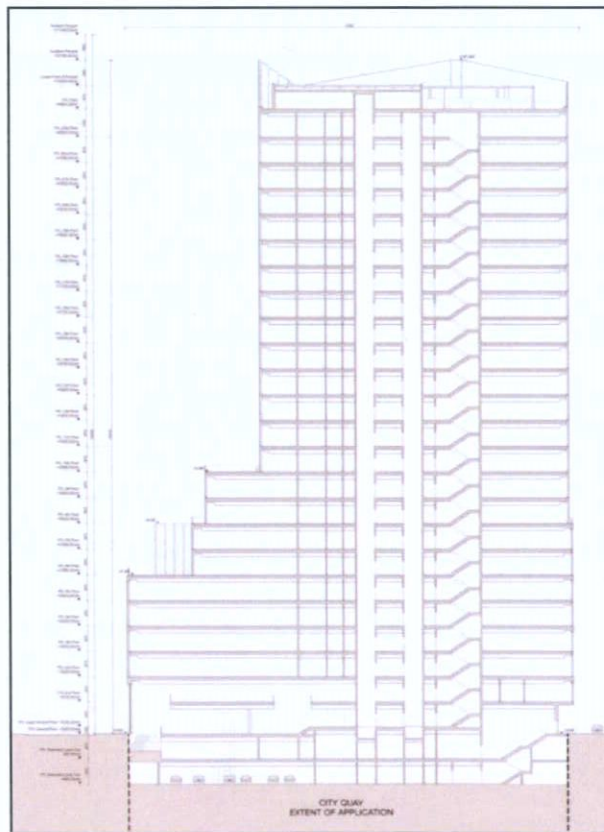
Cross Section of Proposed Development (3DDesign Bureau 2021)
